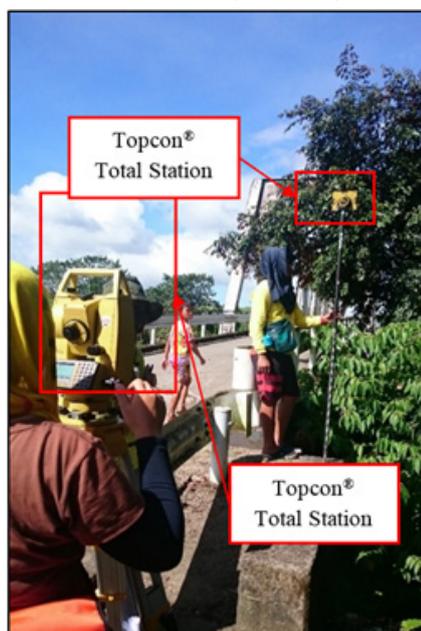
Cross-section and bridge as-built survey at the downstream side of Lapaz-Bulao Bridge, Brgy. Guindapunan, Municipality of San Jorge, Samar
